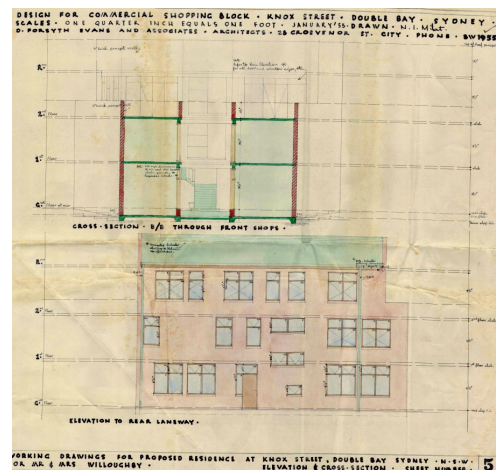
Evan's Knox Lane elevation and section of the proposed "shopping block" at
